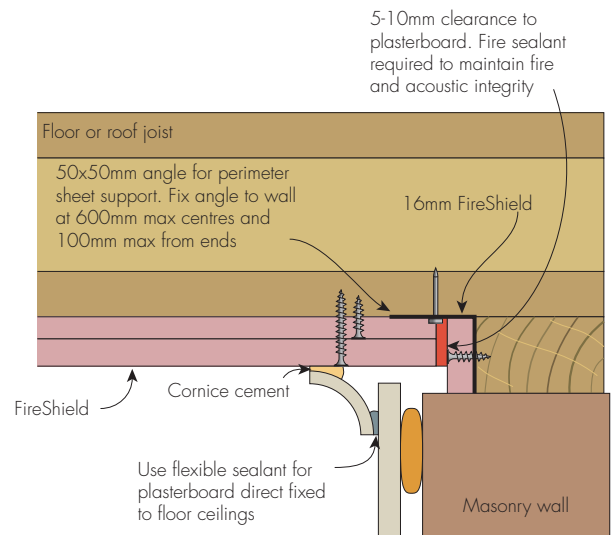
Fire Rated Ceiling to Masonry Wall
